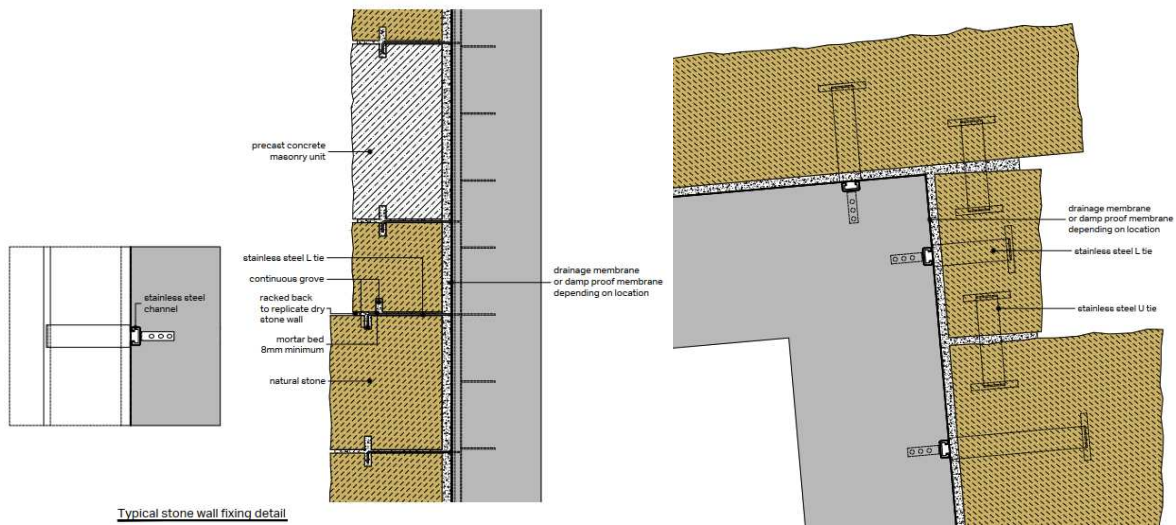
typical stone wall fixing detail (left) – typical open corner detail – horizontal section (right) – credits: MFS
